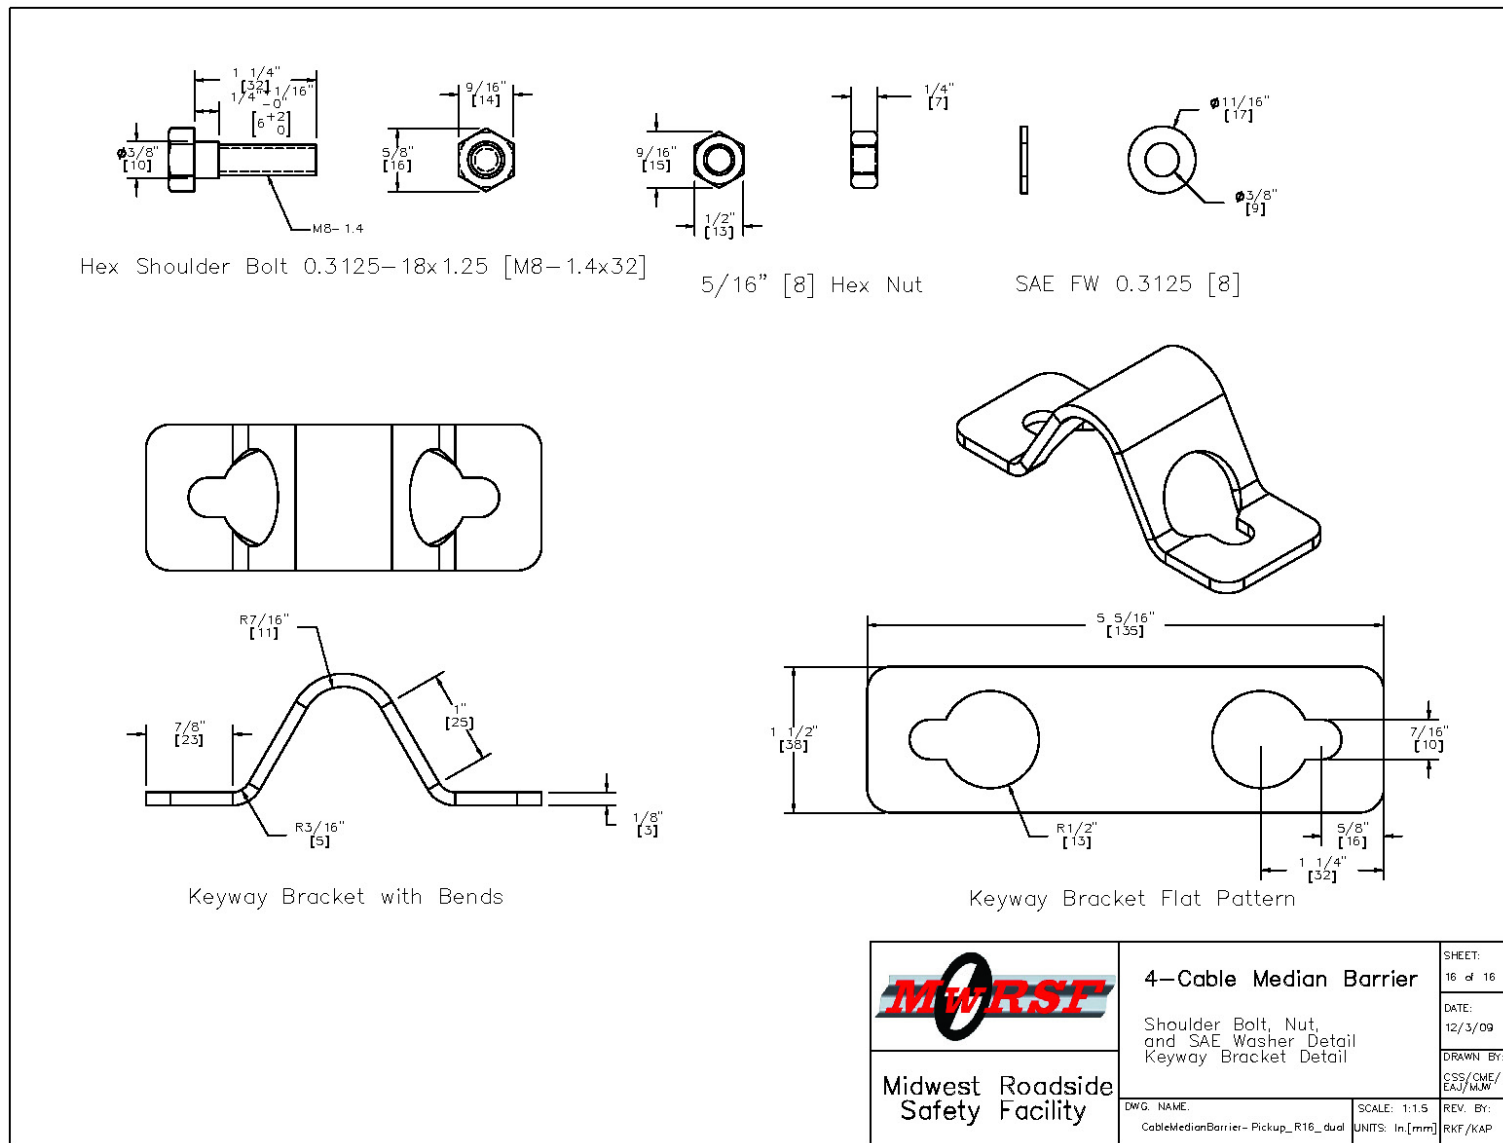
Cable Bracket Details, Test No. 4CMB-1, 2007 [66]
